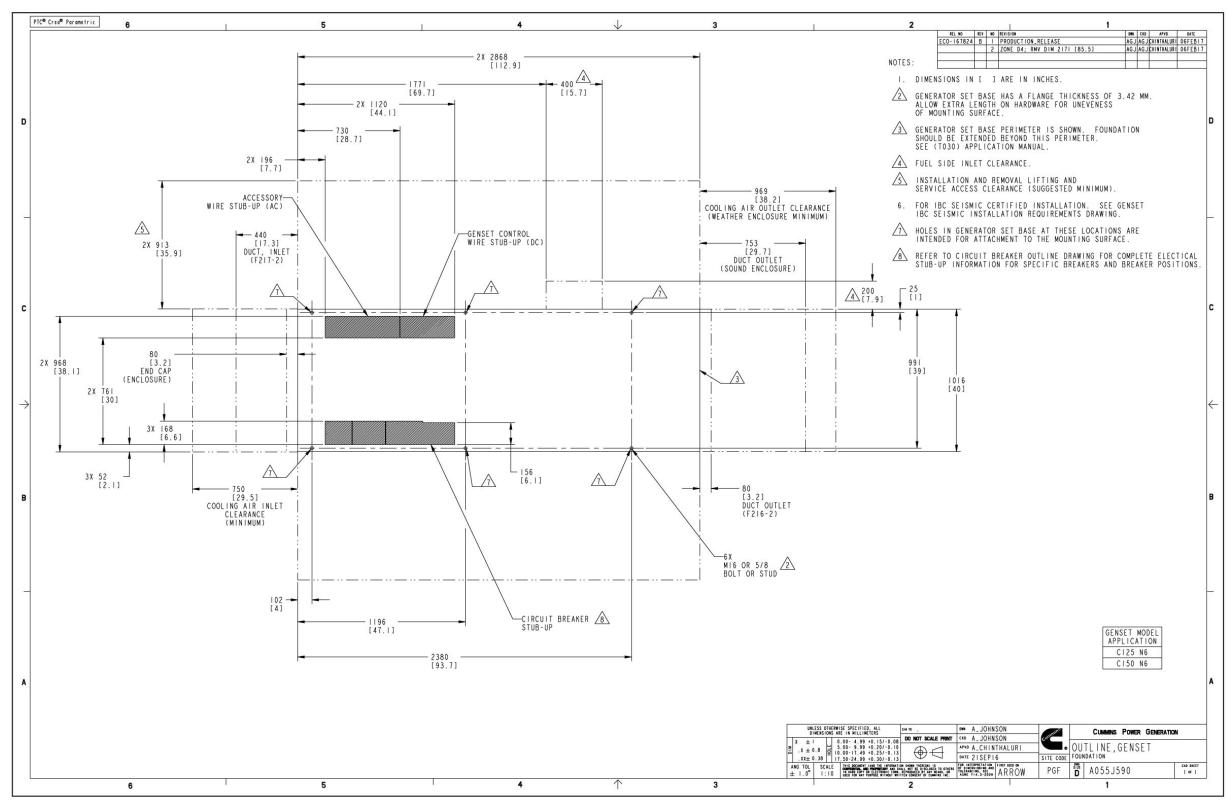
FOUNDATION OUTLINE (SHEET 1 OF 1)
